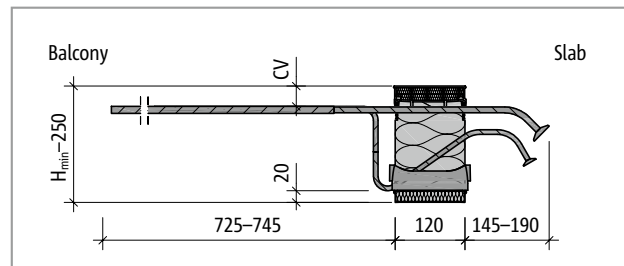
Schöck Isokorb® XT type K-O: Product section
